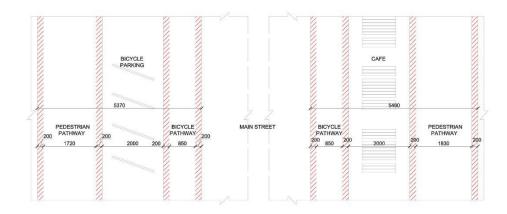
Street width and buffer spaces (in mm) for Gateway 6 in the area surrounding Frankfurt am Main Hauptbahnhof
